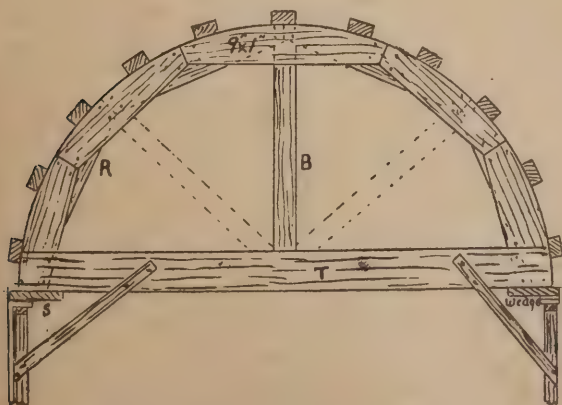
A BUILT-UP RIB CENTRE. ELEVATION.
